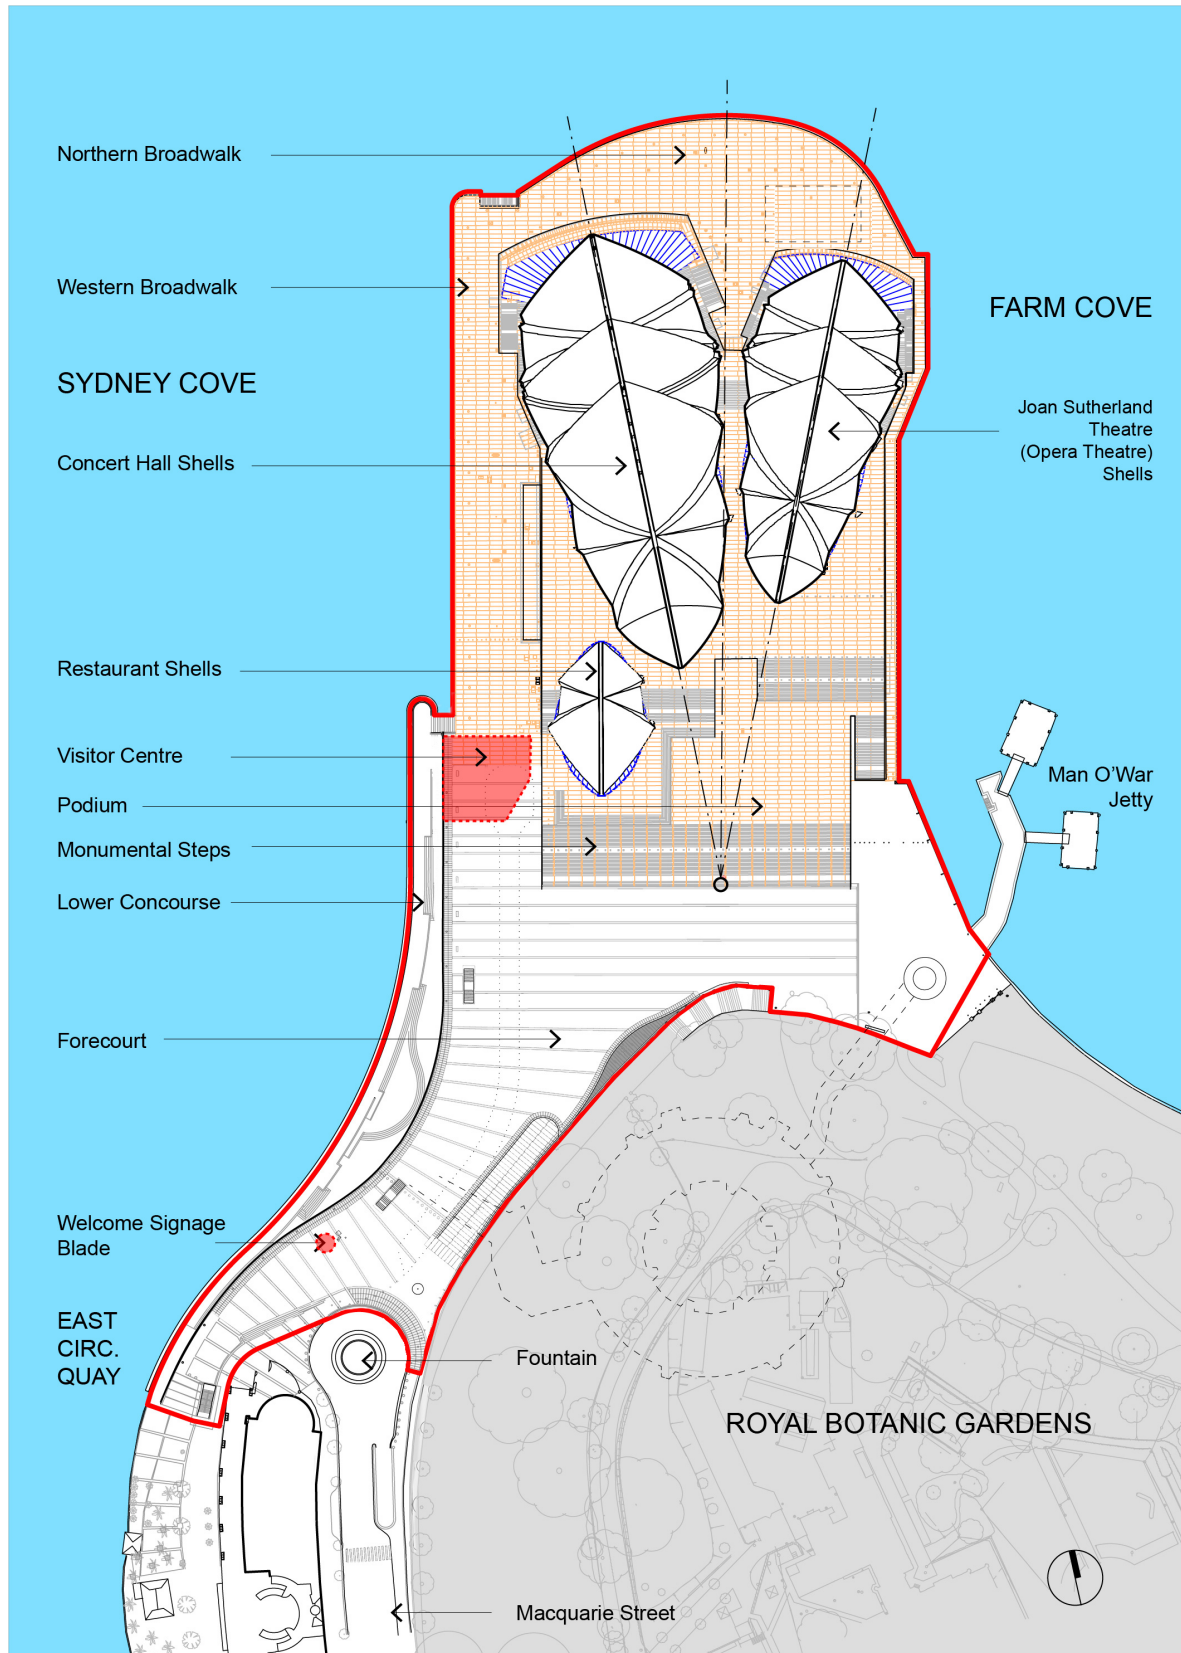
Site plan showing the extent of the SOH boundary under the *Sydney Opera House Trust Act 1961* (NSW), outlined by the red boundary line. Proposed VIC Project works are shaded red.
